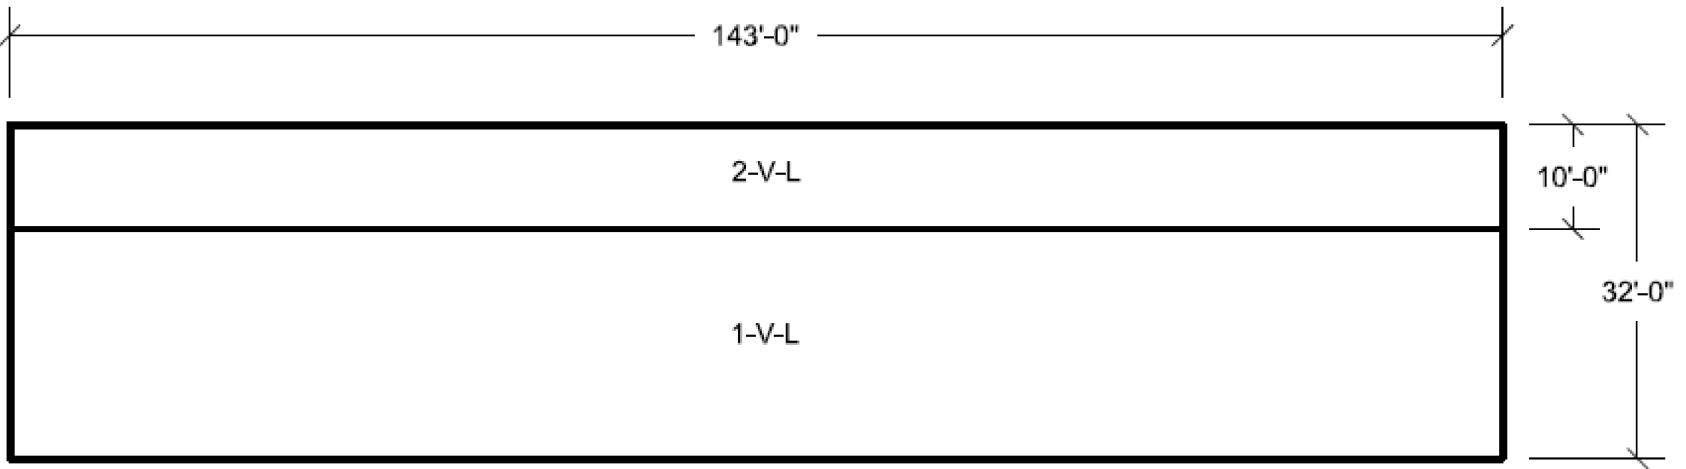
H.6-62 Pump House South Wall Looking South Vertical Reinforcement Zones Near Side Face
